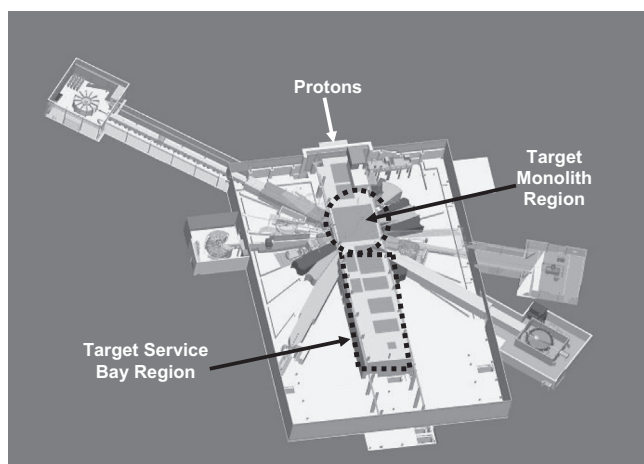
Spallation neutron source target building instrument floor.
